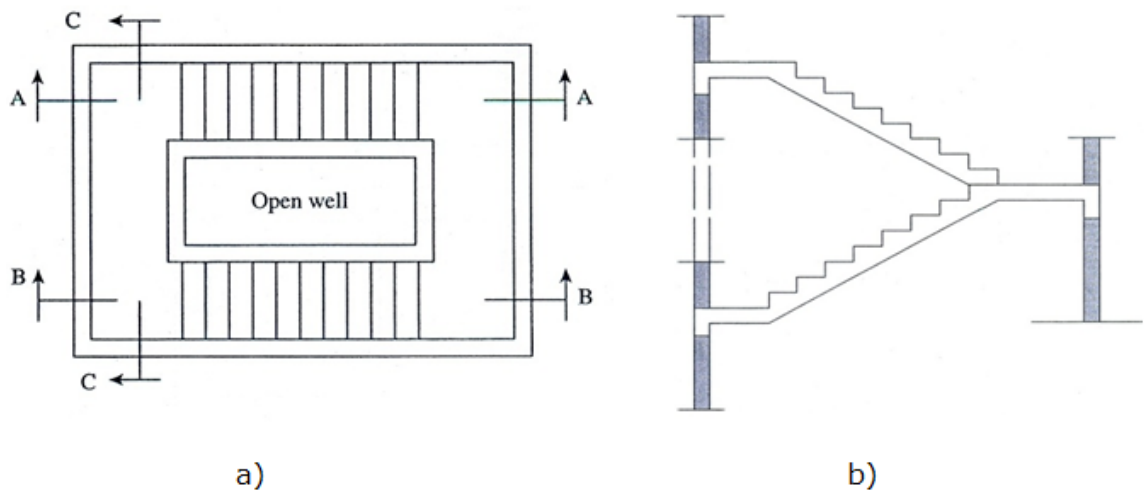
(a) Open Well Stair (b) Section at B-B
